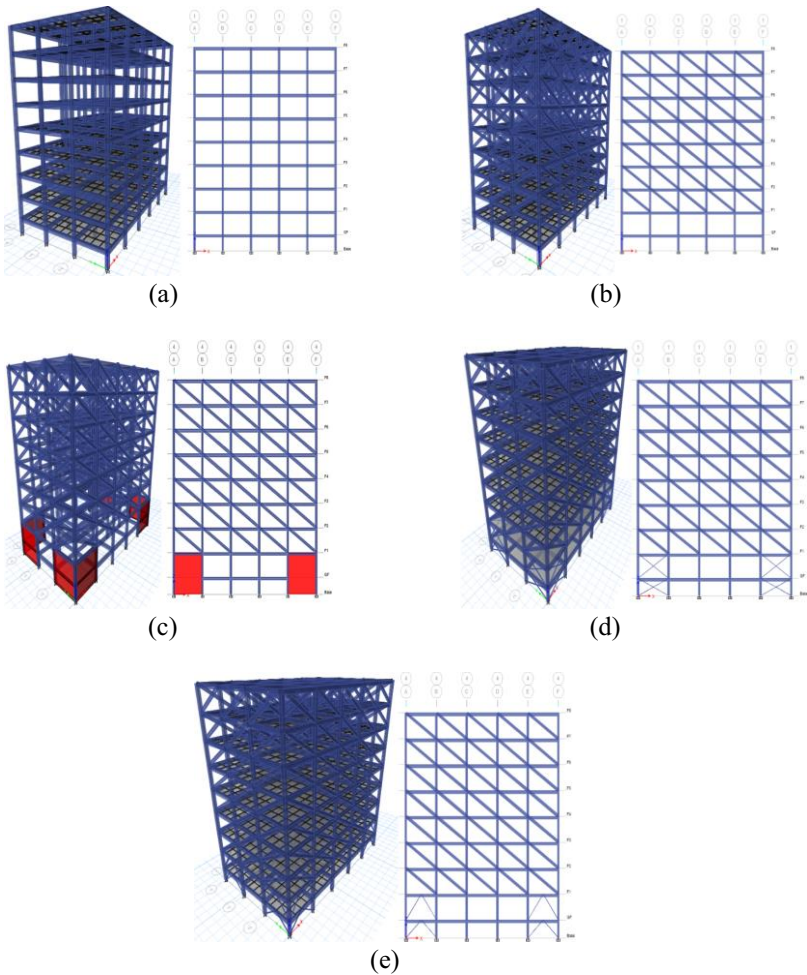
3D view of (a) Bare frame, (b) Soft story frame, (c) Soft story with provision of shear wall. (d) Soft story with provision of steel cross bracing, (e) Soft story with provision of steel Inverted-V bracing.
